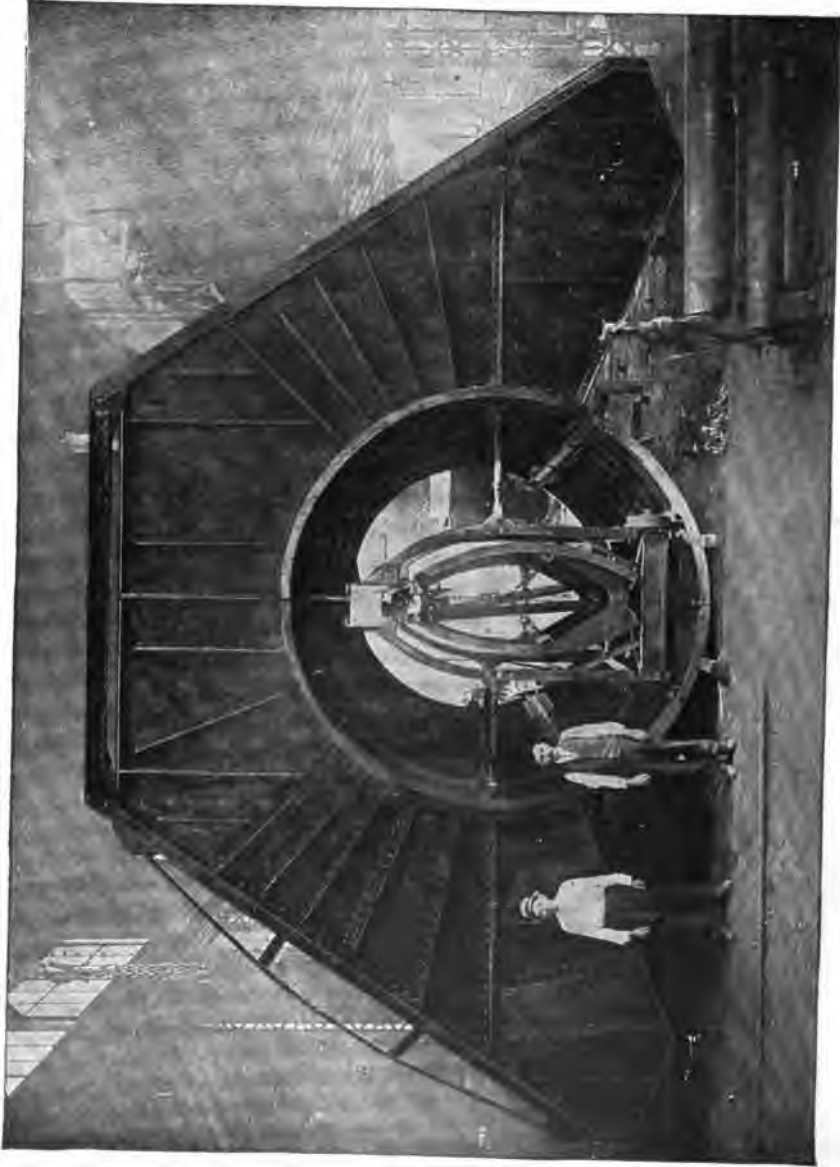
Blow Inside Forms, and Steel Bulkhead for By-pass Aqueduct for Hill View Reservoir as Set Up in Shop.
